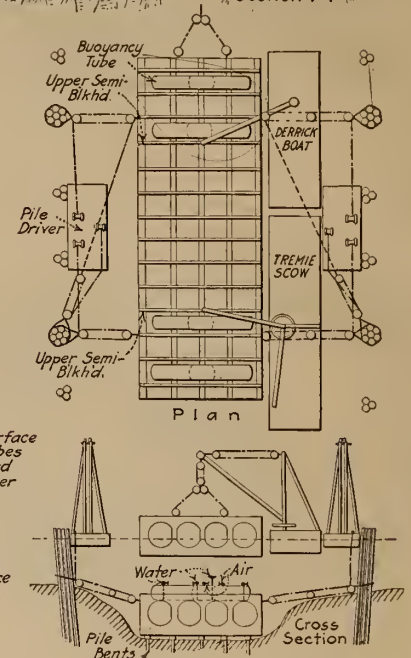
FLOATING EQUIPMENT FOR SINKING TUBES
